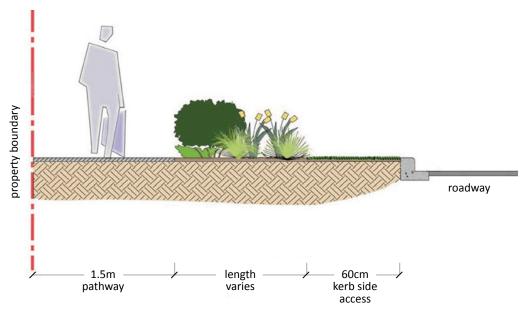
A 60cm access area must be maintained between the kerb and in ground planting.
